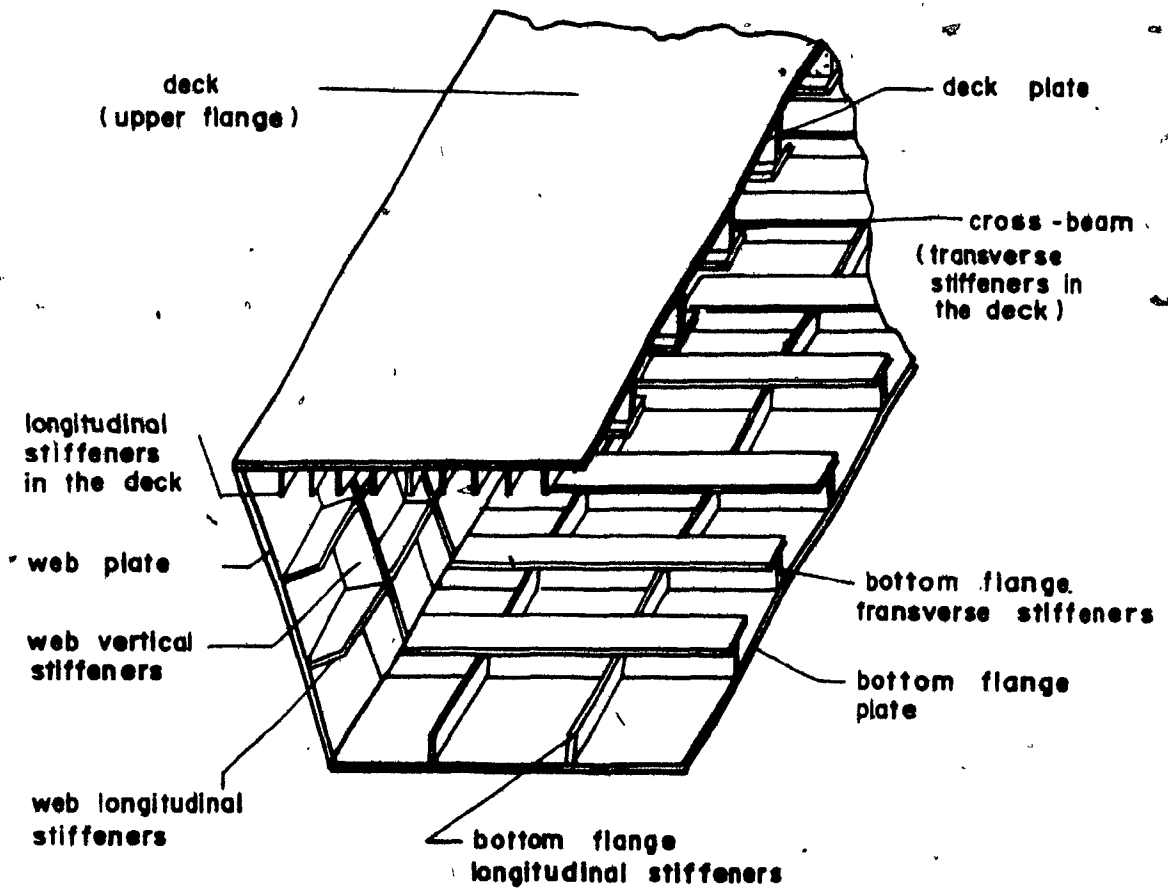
COMPONENTS OF A STEEL BOX GIRDER BRIDGE
